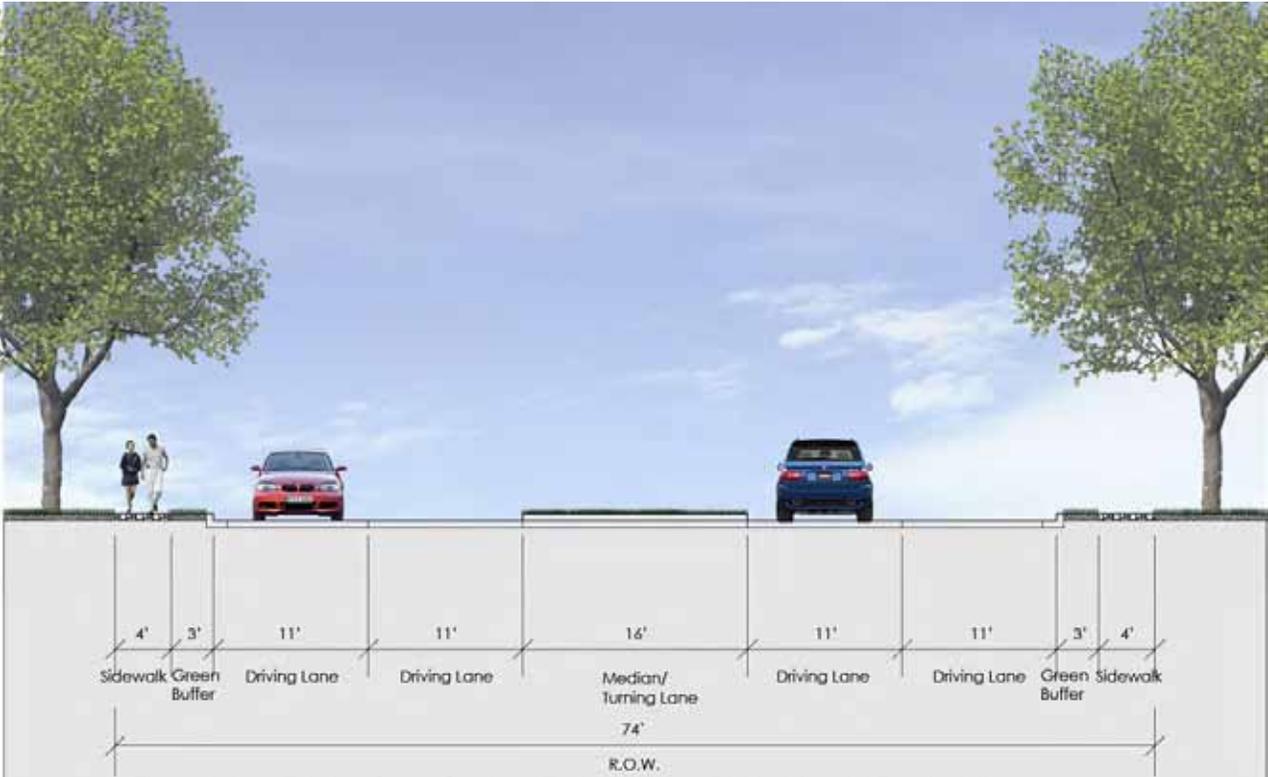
Existing Street Section - Typical 4 Lane, Divided Arterial Road - Arlington
